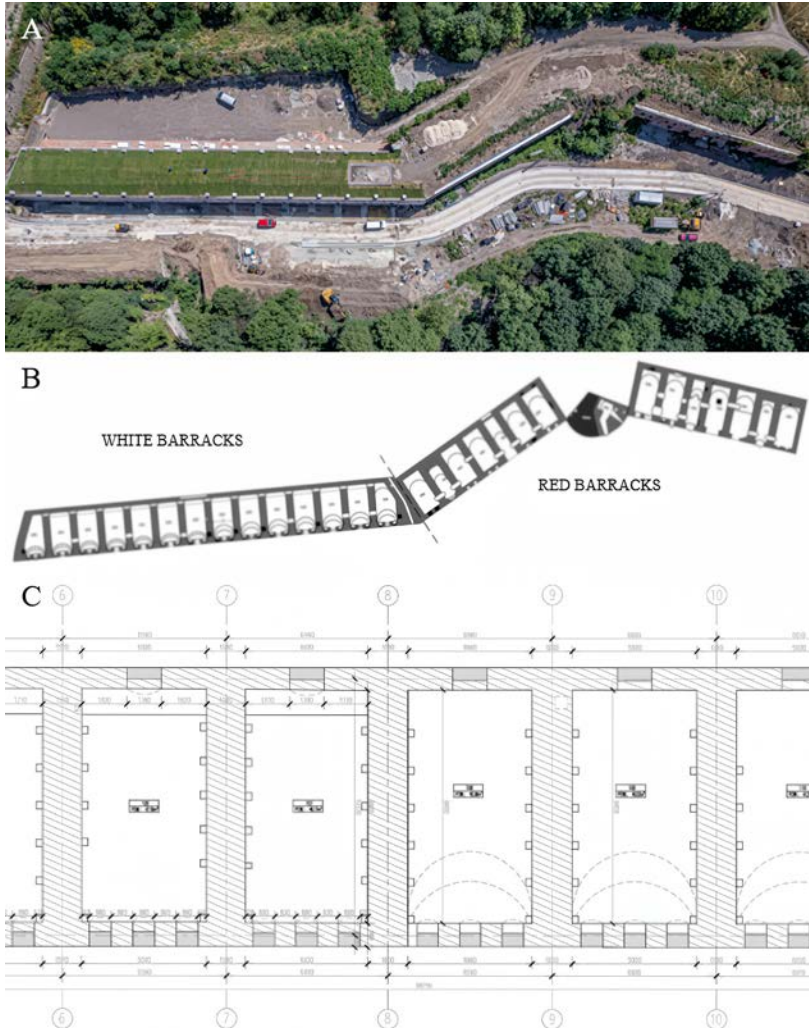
Overhead view of the Barracks (A); Plan of the Barracks (B);
